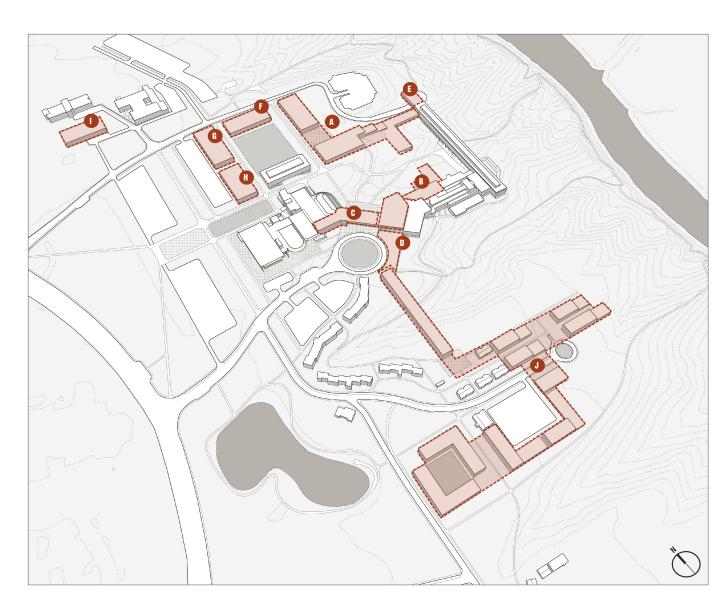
| DEMONSTRATION PLAN (PERSPECTIVE VIEW): QUAD/PLAZA FRONTAGE
